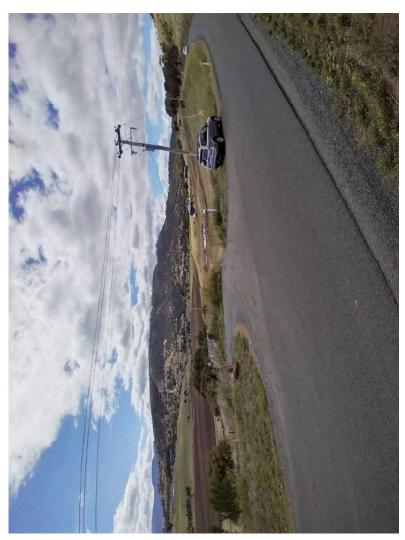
Existing and proposed shared crossover from Cove Hill Road
